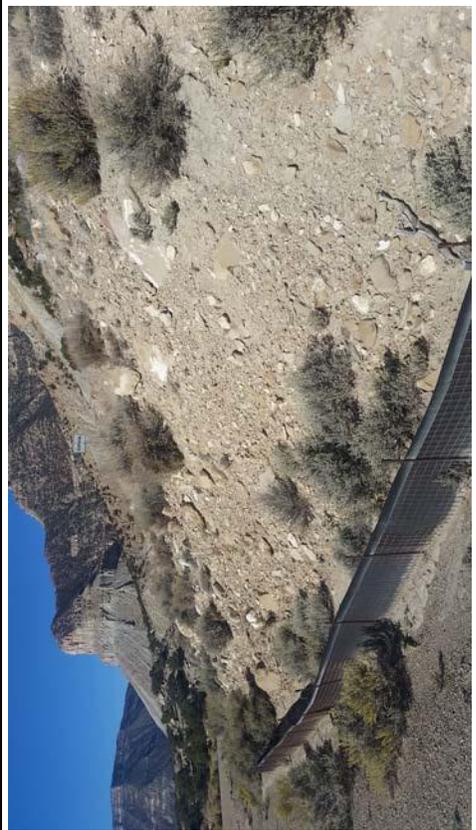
TOPSOIL PILE #2, WASTE ROCK SITE
